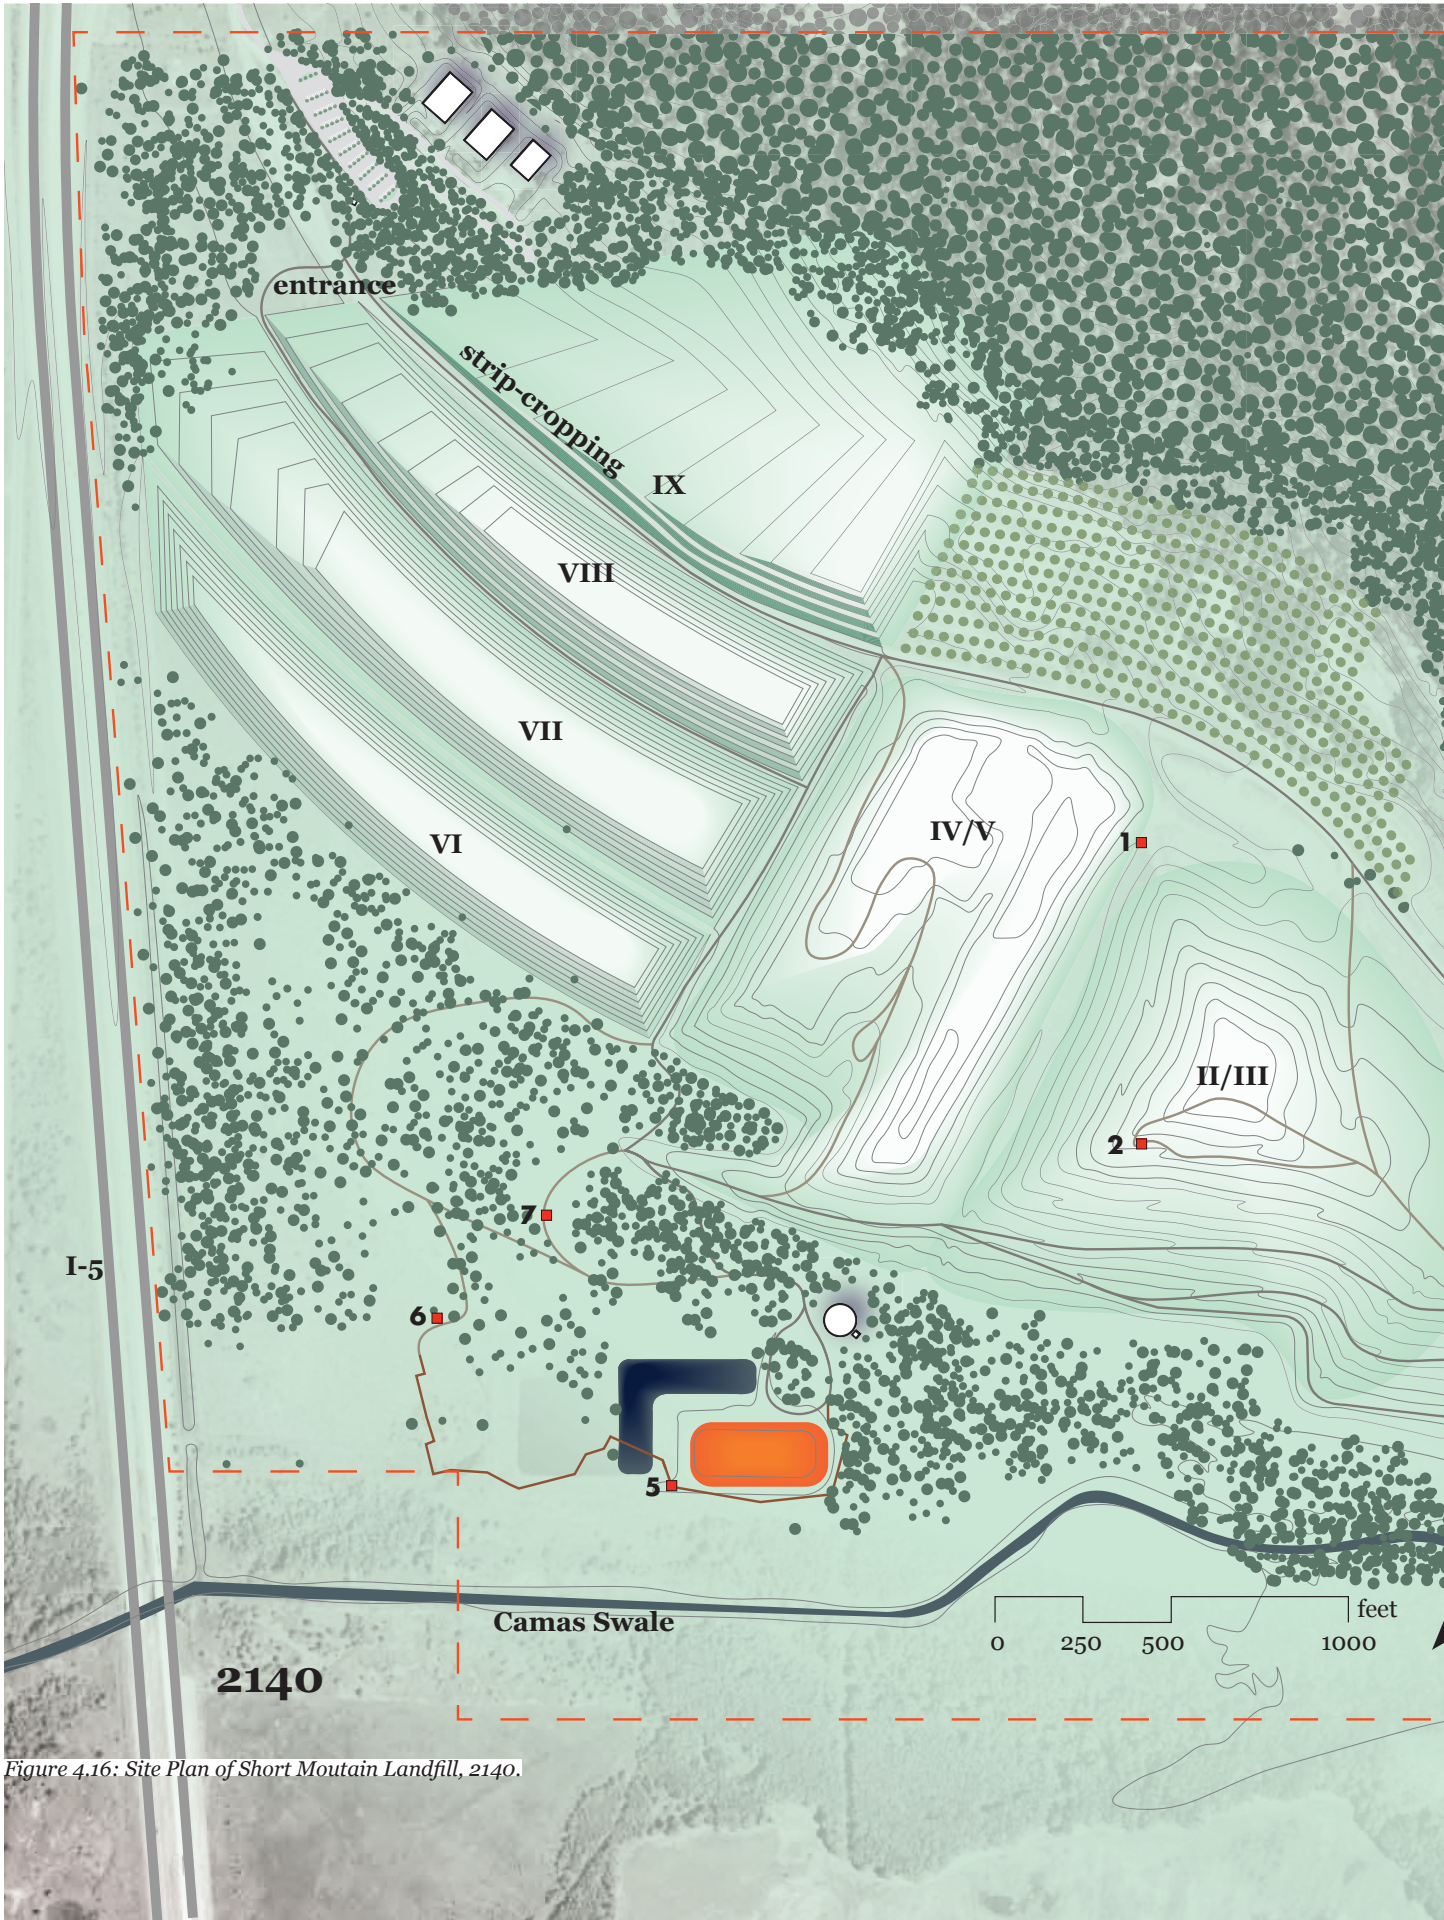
Site Plan of Short Mountain Landfill, 2140.
